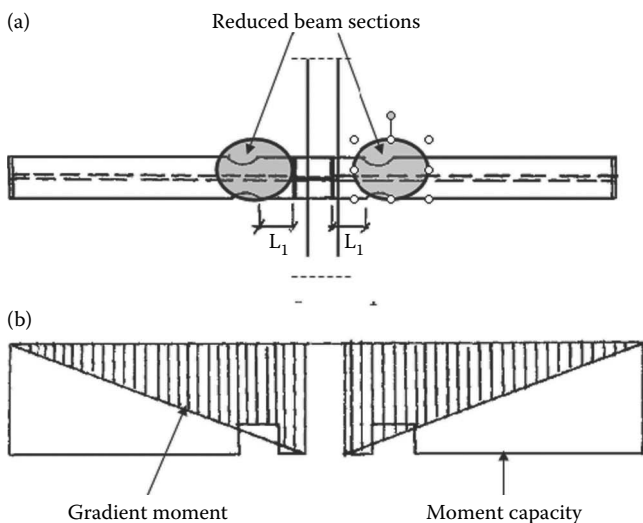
Reduced beam section: (a) beam scheme; (b) positions of RBS.
